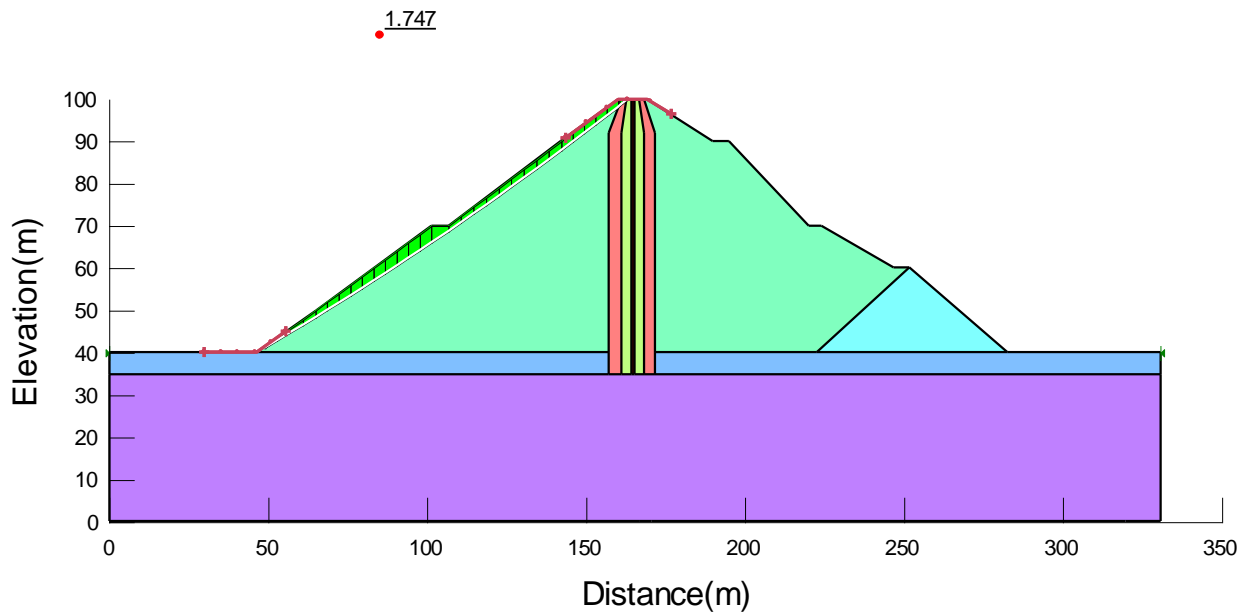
10: Slope Stability at end of construction without Earthquake AC (U/S)
